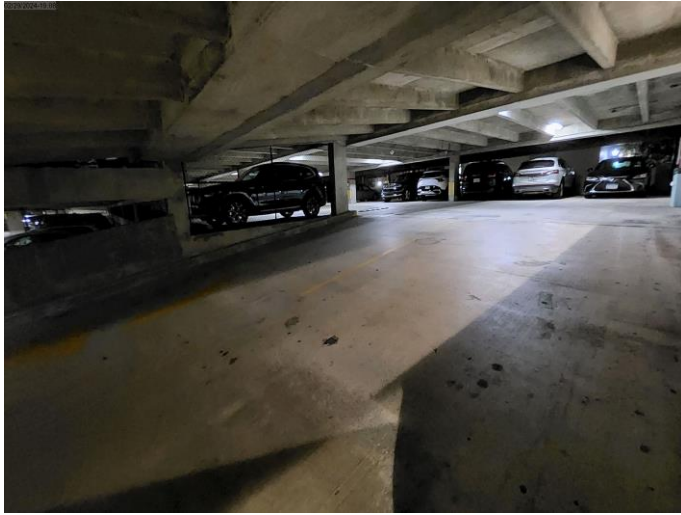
Item 25.b. Ramp Level A and B. Cover parking garage. Missing proper illumination -fc = 0.71.
